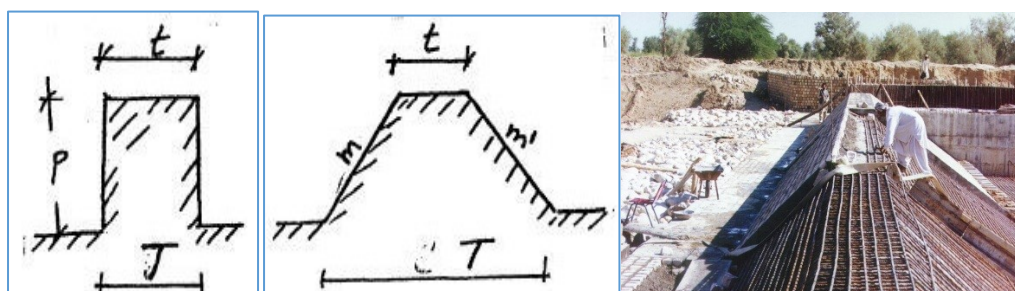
Sketches of typical rectangular (l) and trapezoidal/glacis type weirs (r)
